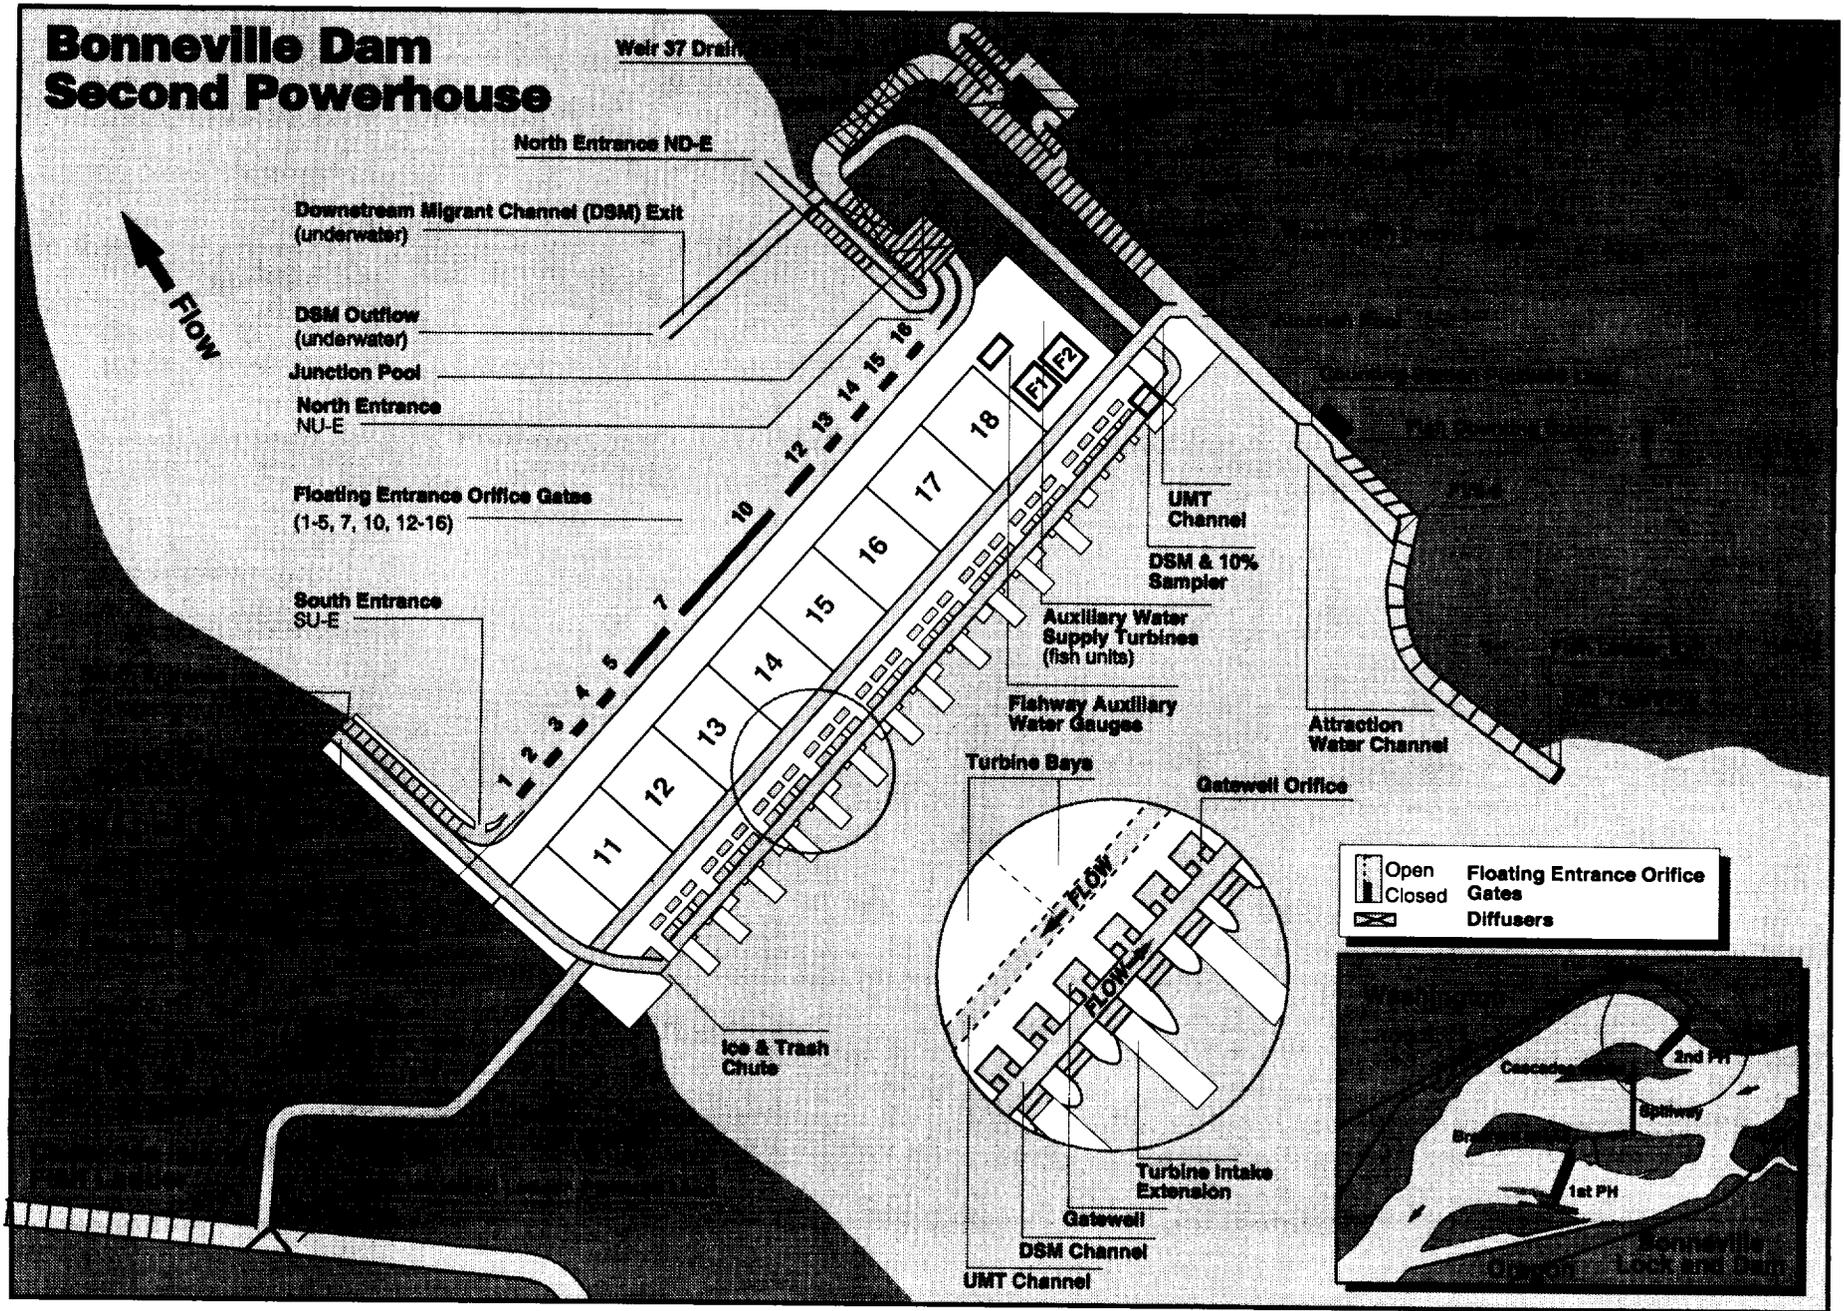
Bonneville Dam Second Powerhouse and Washington (North) Fish Ladder.
